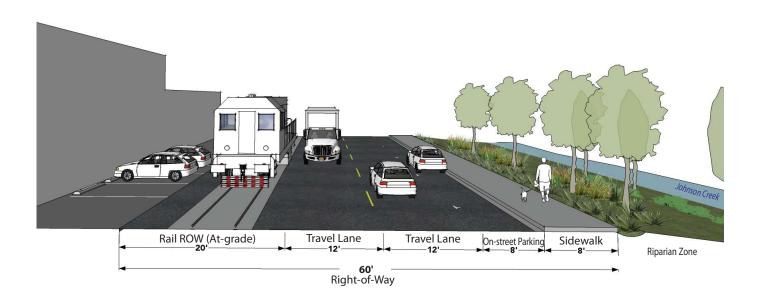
CONCEPTUAL CROSS-SECTION FOR STUBB ST WITH CONTINUOUS ACCESS (LOOKING EAST)
